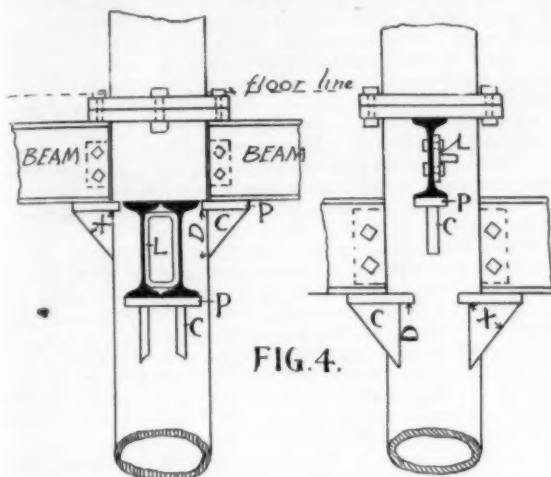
shows the usual method of connecting iron floor-beams and girders with cast-iron columns. The ends of the beam and girder rest on plates P cast on the columns, and the plates are supported by cast brackets C , so that no transverse strain can come upon the plate. For single beams, one bracket is sufficient; for double beams, or for wide beams or riveted girders, two brackets should be used. The ends of the beams and girders are fastened to the column by bolting to the lugs L , which are also cast on the column.
